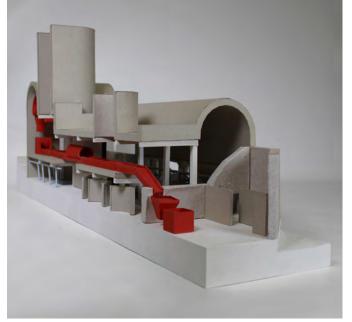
Final section model cutting through entrance steps/seats, ground floor entrance and exhibition space, first floor factory (710mm x 150mm)
